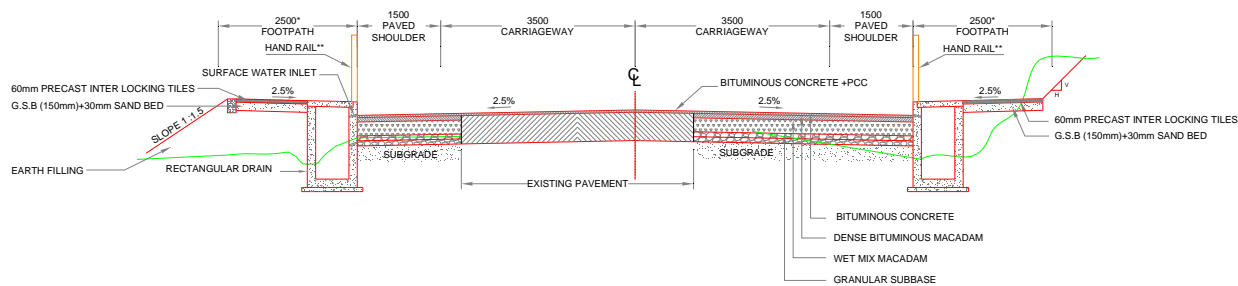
TYPICAL CROSS SECTION- TYPE-1
